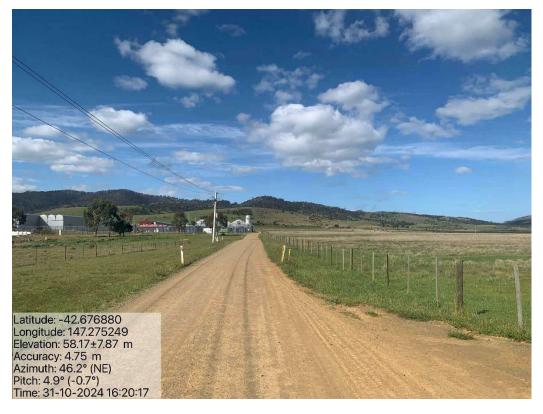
View east from the entry gate showing existing access road and eastern boundary of the balance lot on the ridgeline of Shene Hill in the background.
